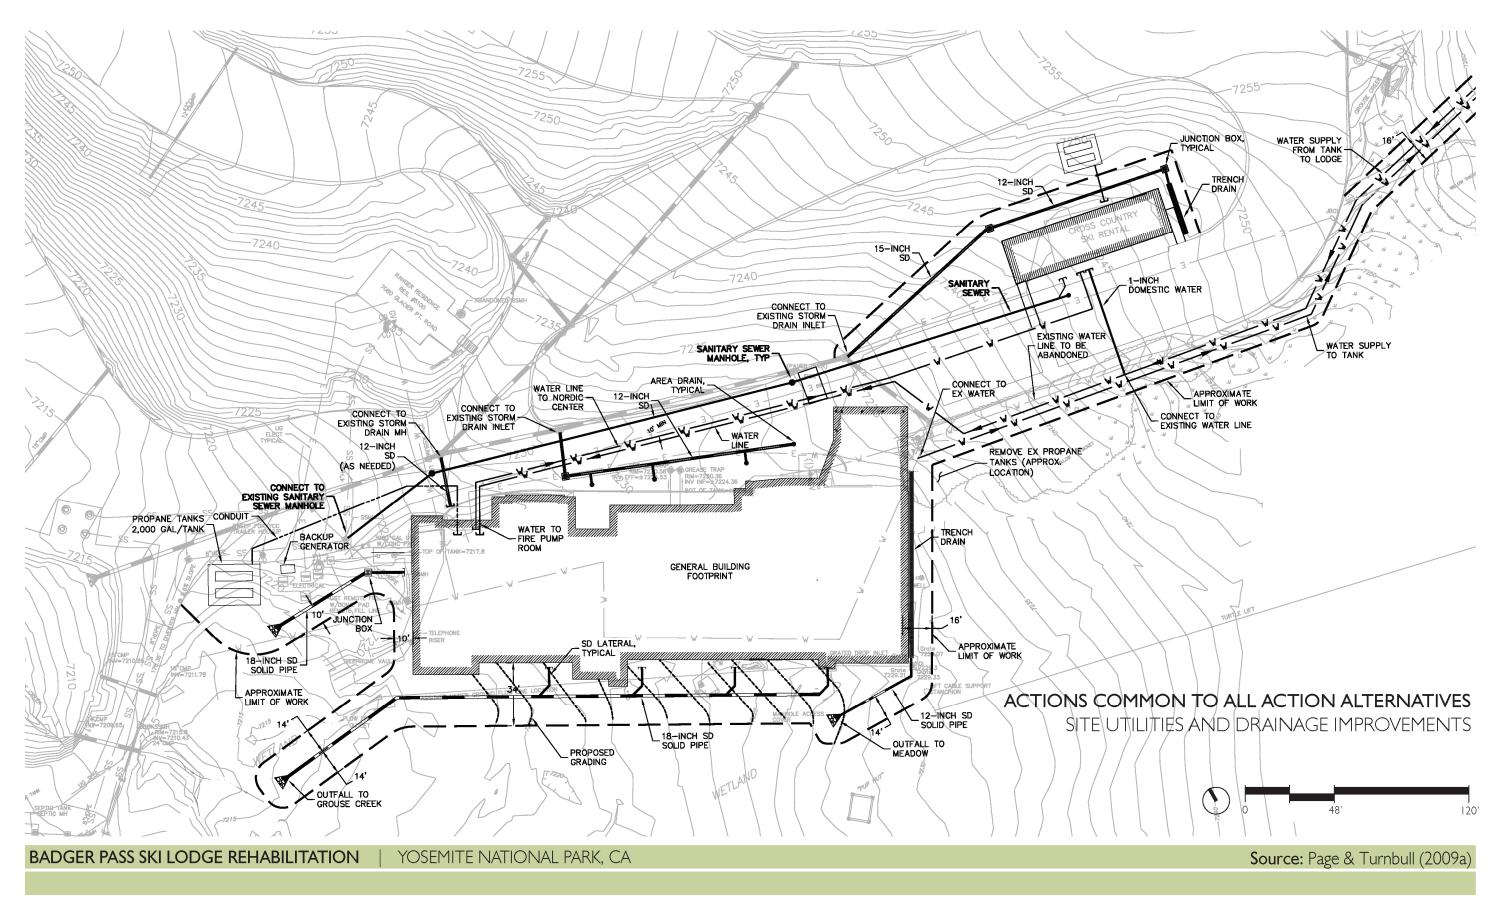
Actions Common to All Action Alternatives – Site Utility and Drainage Improvements.
